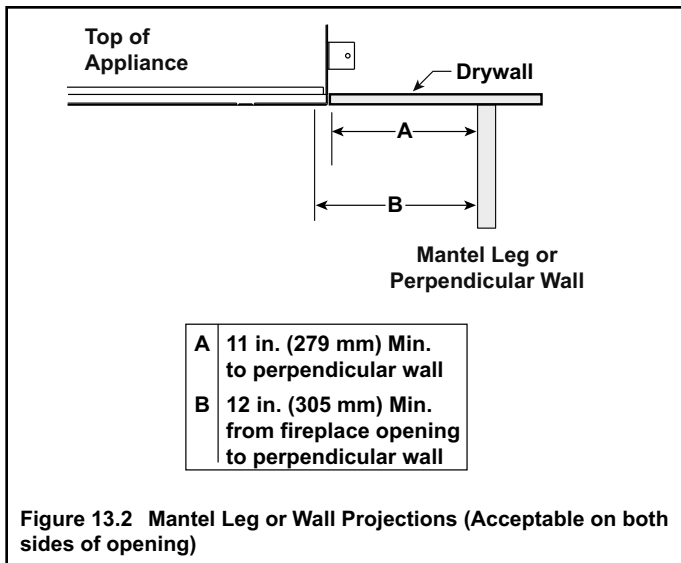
Mantel Leg or Wall Projections (Acceptable on both sides of opening)
